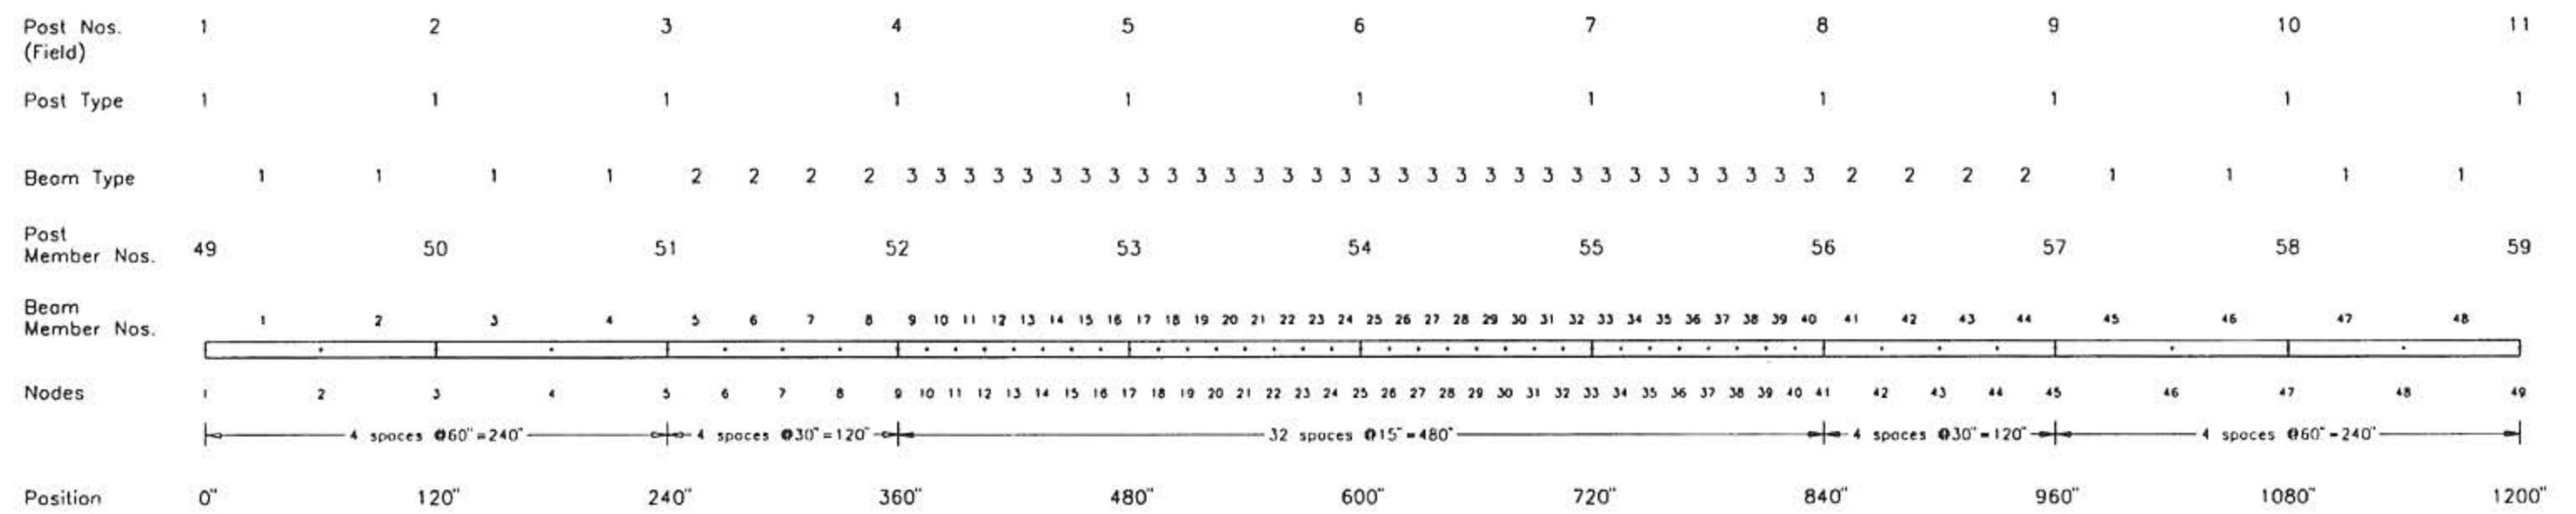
Finite Element Model of the Curb-Type Bridge Railing
